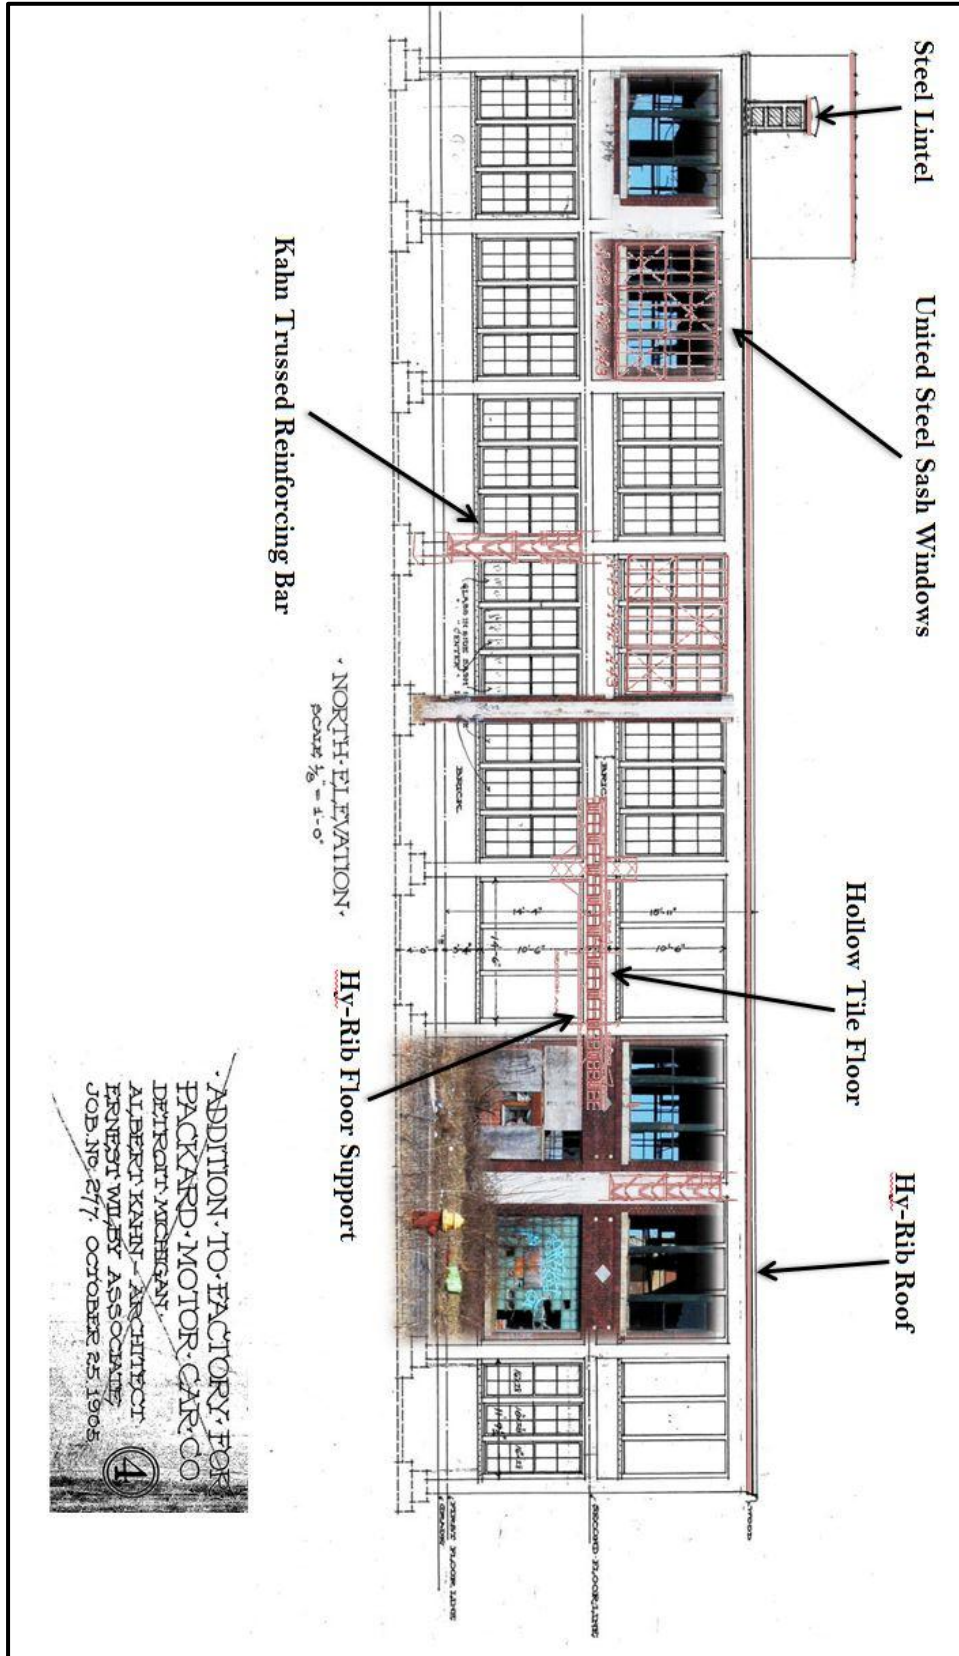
Trussed Concrete Steel Company Products Used in Packard #10, Elevation View.
